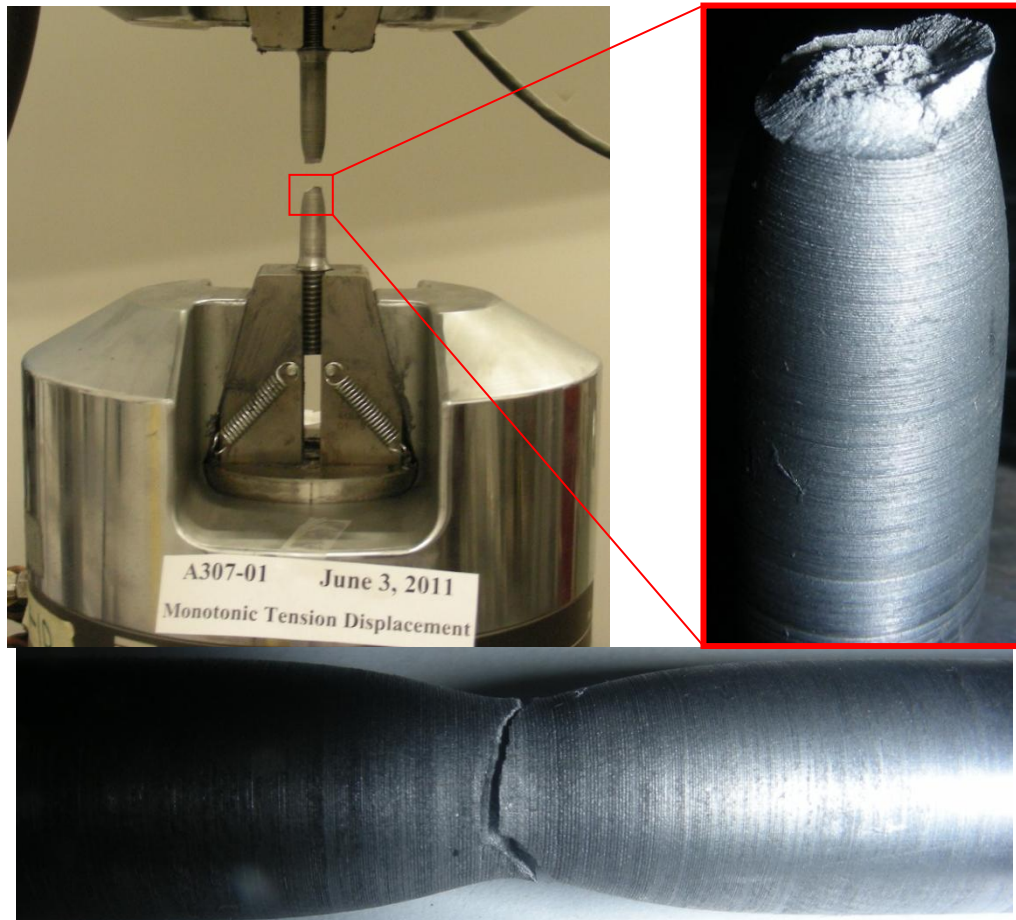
Tensile fracture surface of A307 anchor rod
